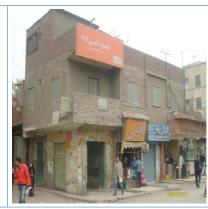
Typical non-engineered buildings in Egypt (Photos by NRIAG, Egypt)
